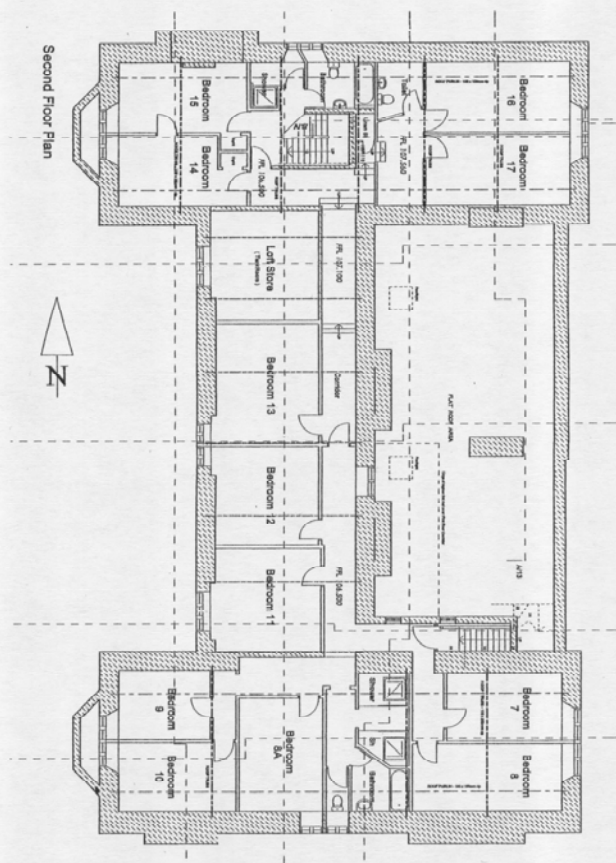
Launde Abbey: Second Floor Plan. Scale: 1:200.
